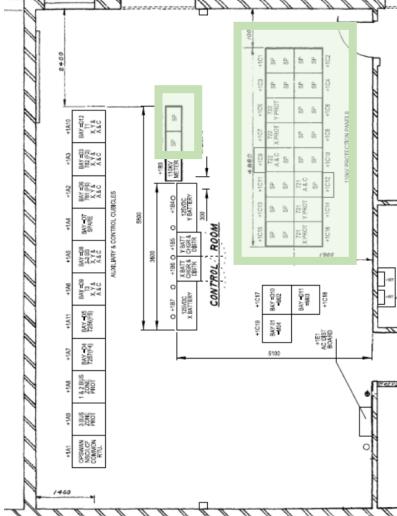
Substation Secondary Systems Building +1 Internal View 6.
